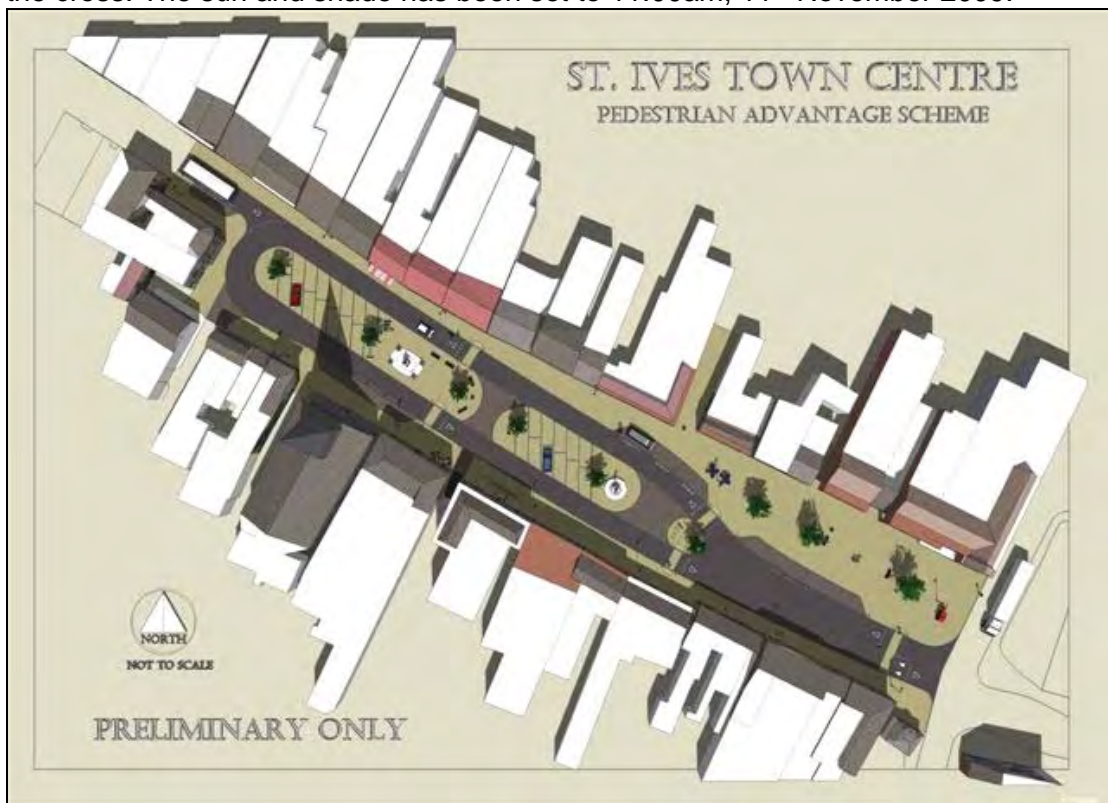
A 3D plan view of the Pedestrian Advantage Scheme.
